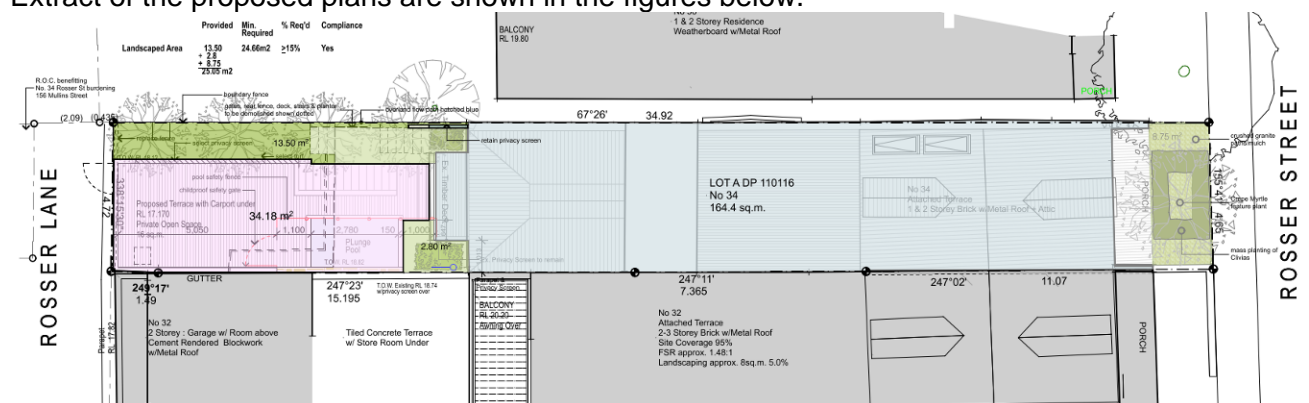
Proposed site plan at 34 Rosser Street Rozelle.
